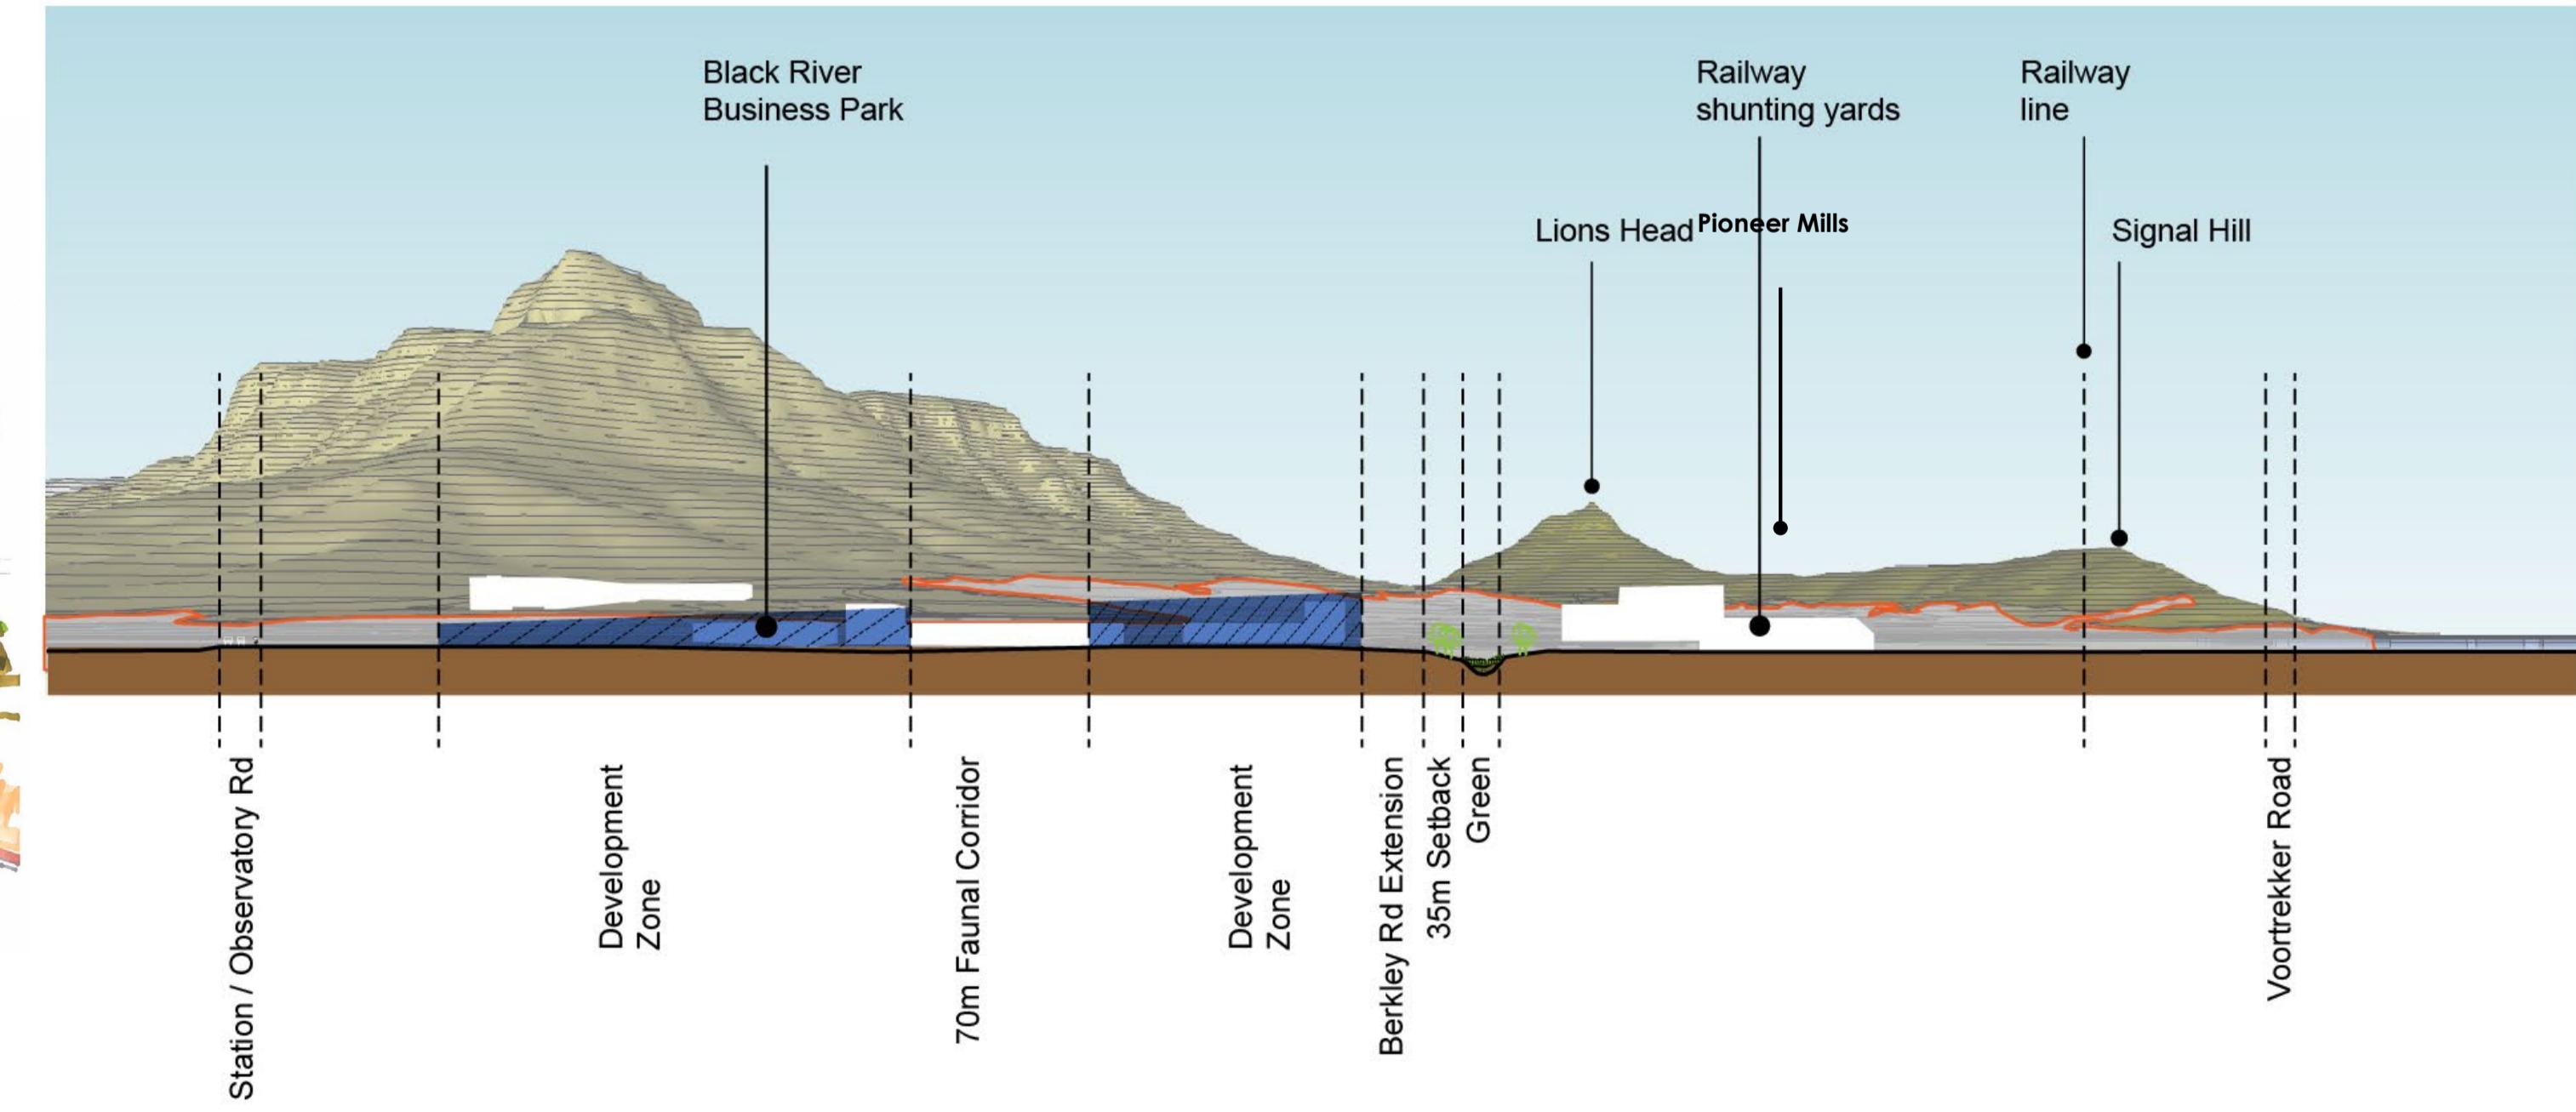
Cross section B through Precinct A from Observatory Road through to Voortrekker Road, showing existing buildings in white and height guidelines in blue hatch.
